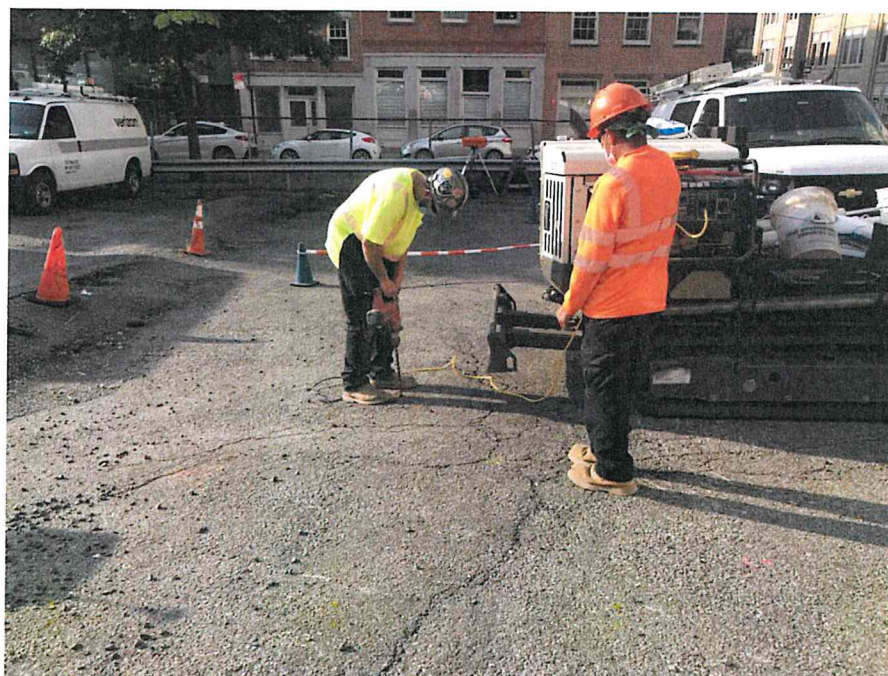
AARCO installing sub-slab vapor probe at Void 1 (facing south)
